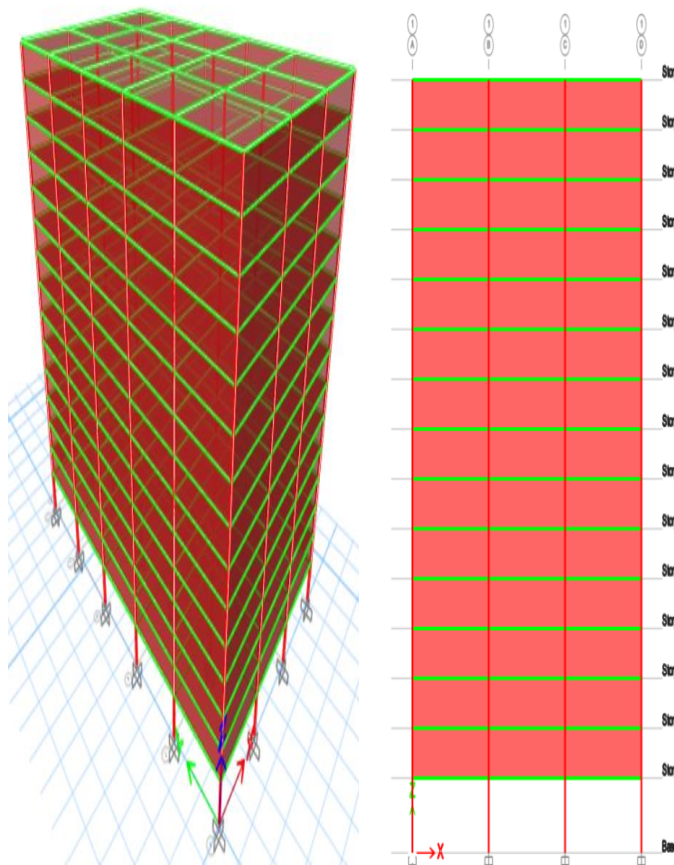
3D and Elevation view of Model, ground floor open and rest all filled with infill walls
